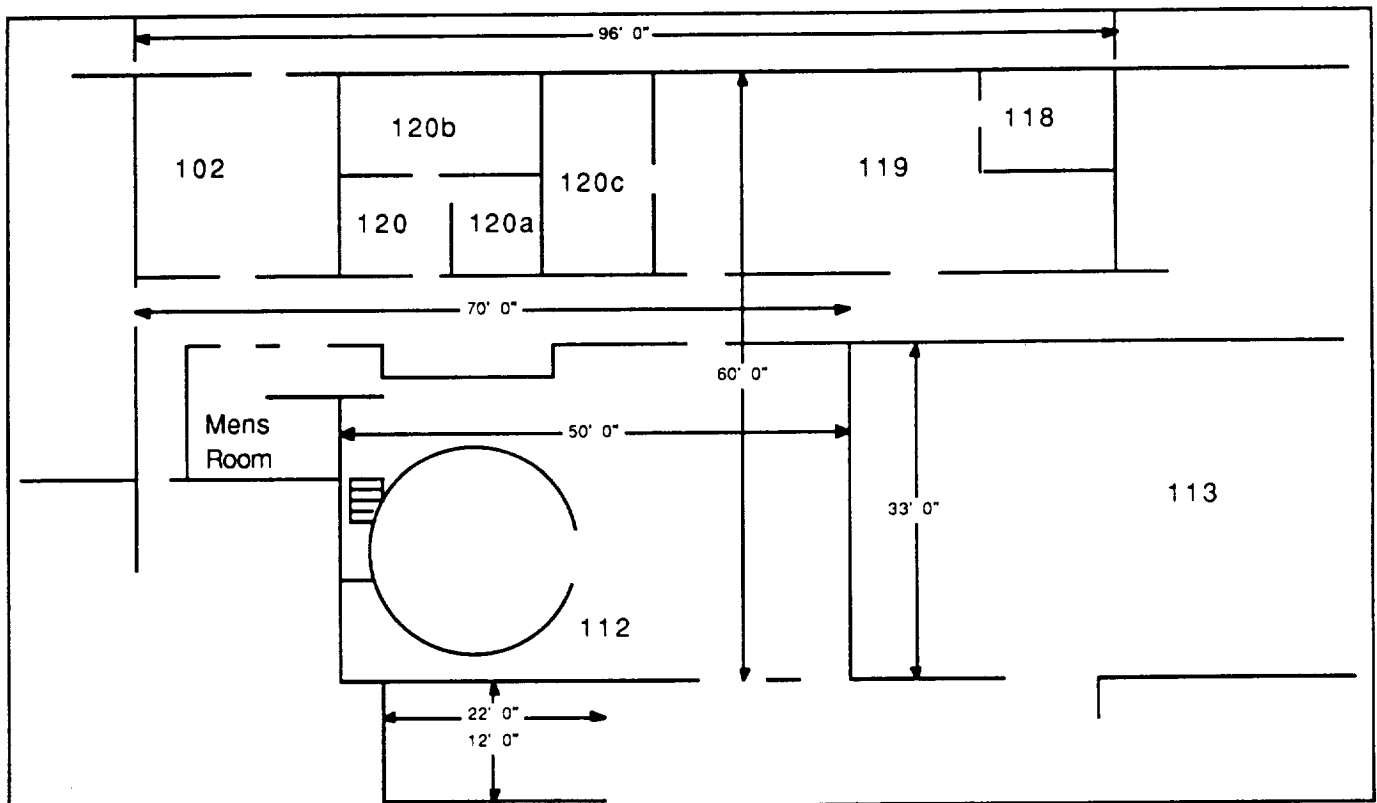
DESIGNATED GBT AREA, MSFC BUILDING 4476, FIRST FLOOR
